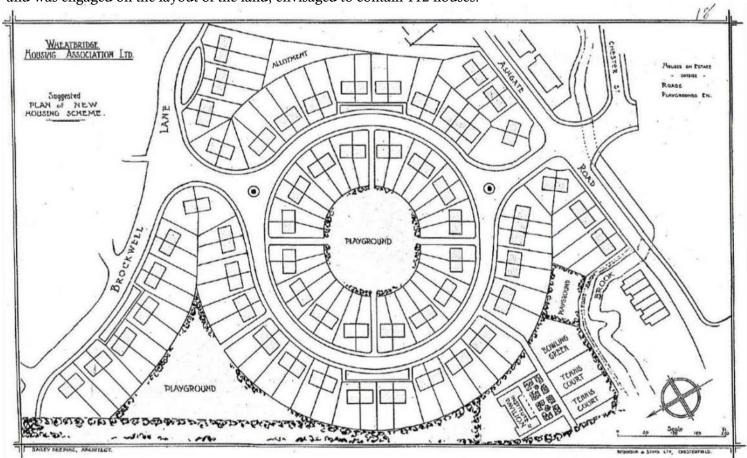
Original suggested plan of the housing scheme proposed by "Wheatbridge House-Building Association".
